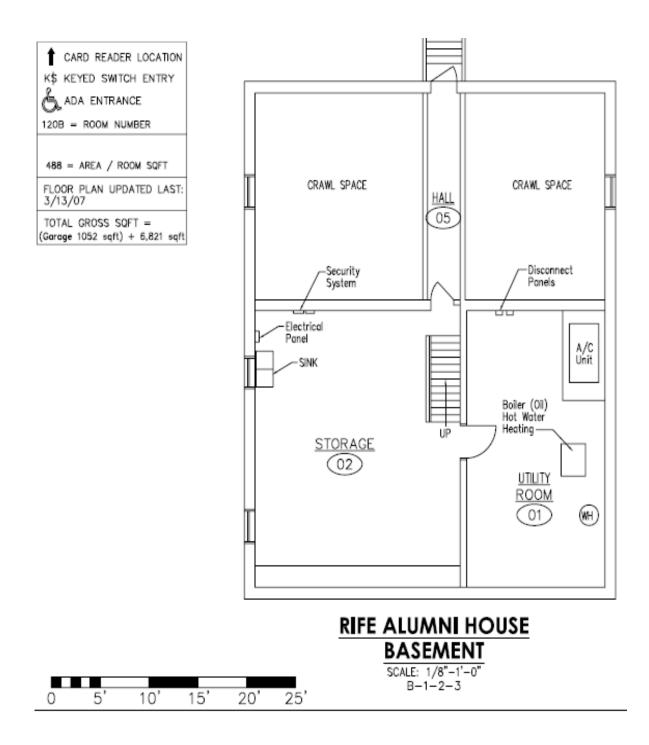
Study Site – Shippensburg University Richard D. Rife Alumni House basement floor plan.
